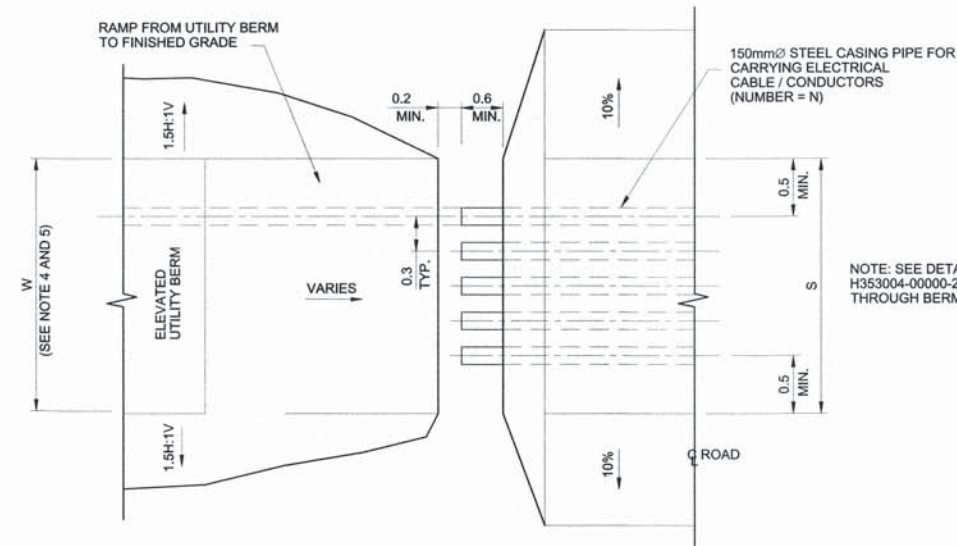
CULVERT BENEATH UTILITY BERM ON DRIVABLE SURFACE
